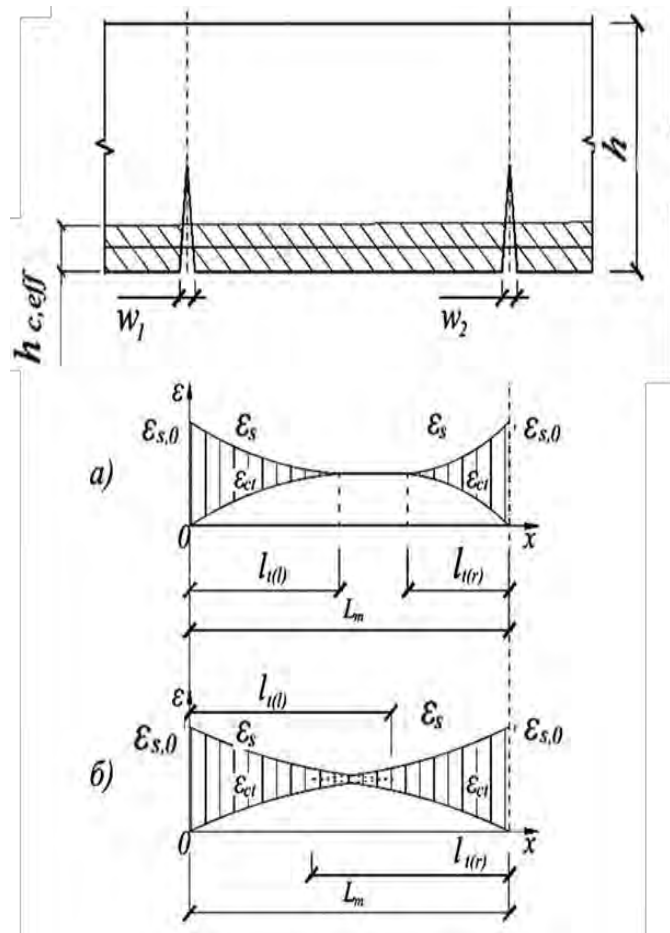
Distribution of relative deformations of concrete and reinforcement along the length of the reinforced concrete block: a - at the first stage of cracking; b - at the second stage of cracking
